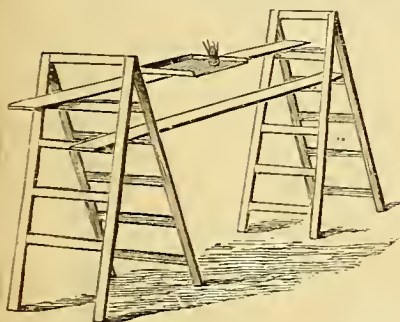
PAINTING BRIDGE OF BOARDS SUPPORTED ON TRESTLES.
